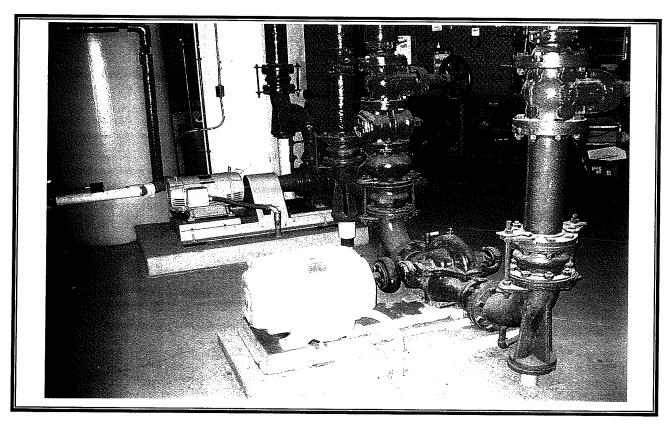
Photo Date 12/05/06 Midtown Tower - 3-rd Floor Mechanical Room Original 40 HP Domestic water pumps, Used as back up.
